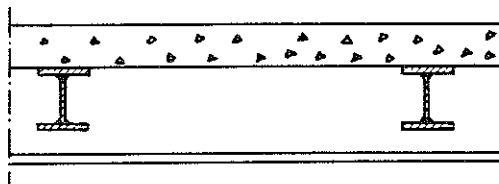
Floor structure, composed of a reinforced concrete slab, load-bearing steel beams, and an insulating ceiling
